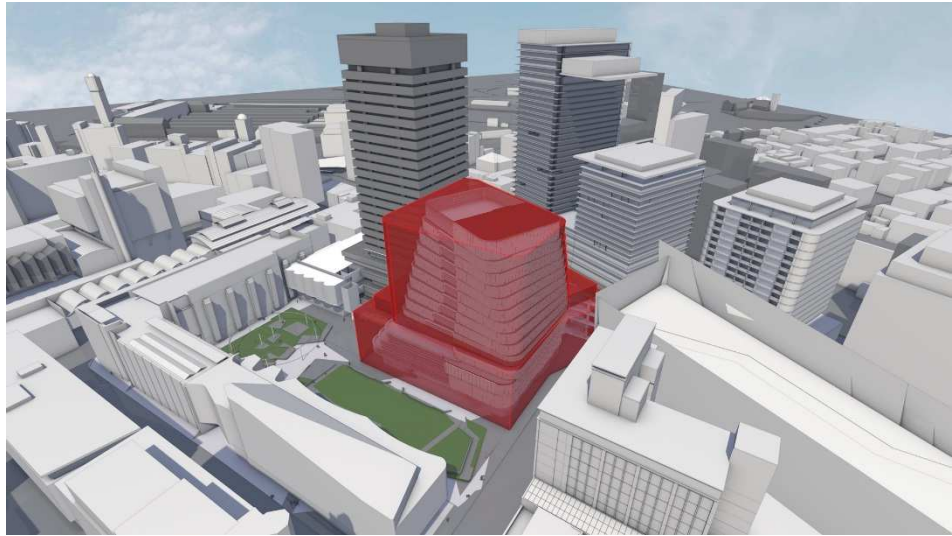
Aerial image of the approved building envelope framing CB02 Tower
